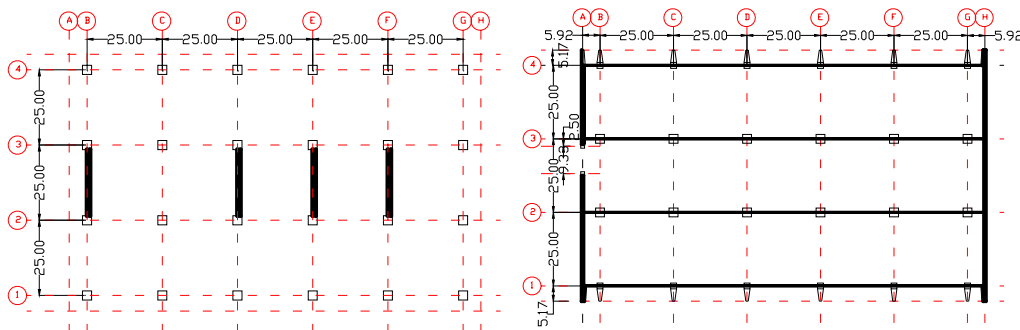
(left) plan view of the ground level, (right) typical plan view of stories two and above
